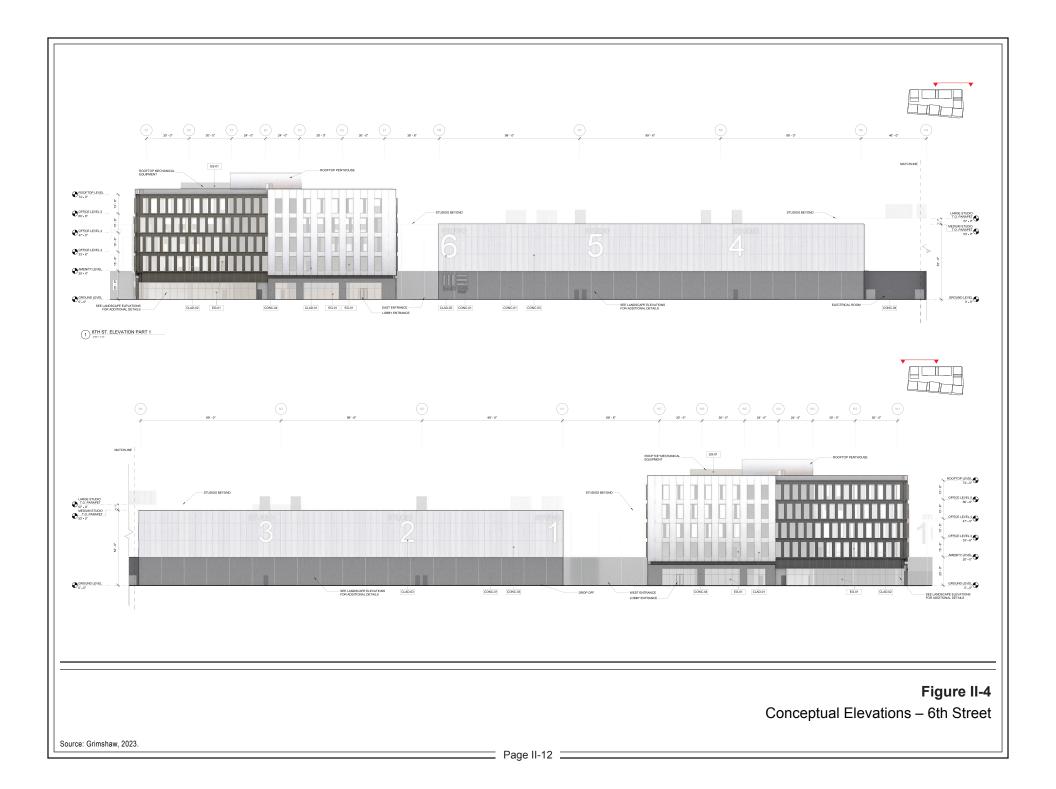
through Figure II-7 on pages II-12 through II-15 provide conceptual elevations and renderings of the Project as viewed from the surrounding streets. As shown, the proposed design of the Project provides variable massing and a variety of materials and texture on the public-facing street façades. Wrapping the principal urban corners of each side of the Project Site at 6th Street and Alameda Street and at 6th Street and Mill Street, high-quality, transparent and engaging storefront glazing would clad the lobby of each creative office building at the street level. The studio buildings along 6th Street would utilize textured concrete and paint to create visual interest, and space would be provided for landscaping in front of each. Along Mill Street and Alameda Street, landscaped areas would provide additional green open space along the public right-of-way. On 6th Street, planters would be sized appropriately to accommodate trees and screening plants directly adjacent to studio building walls.
